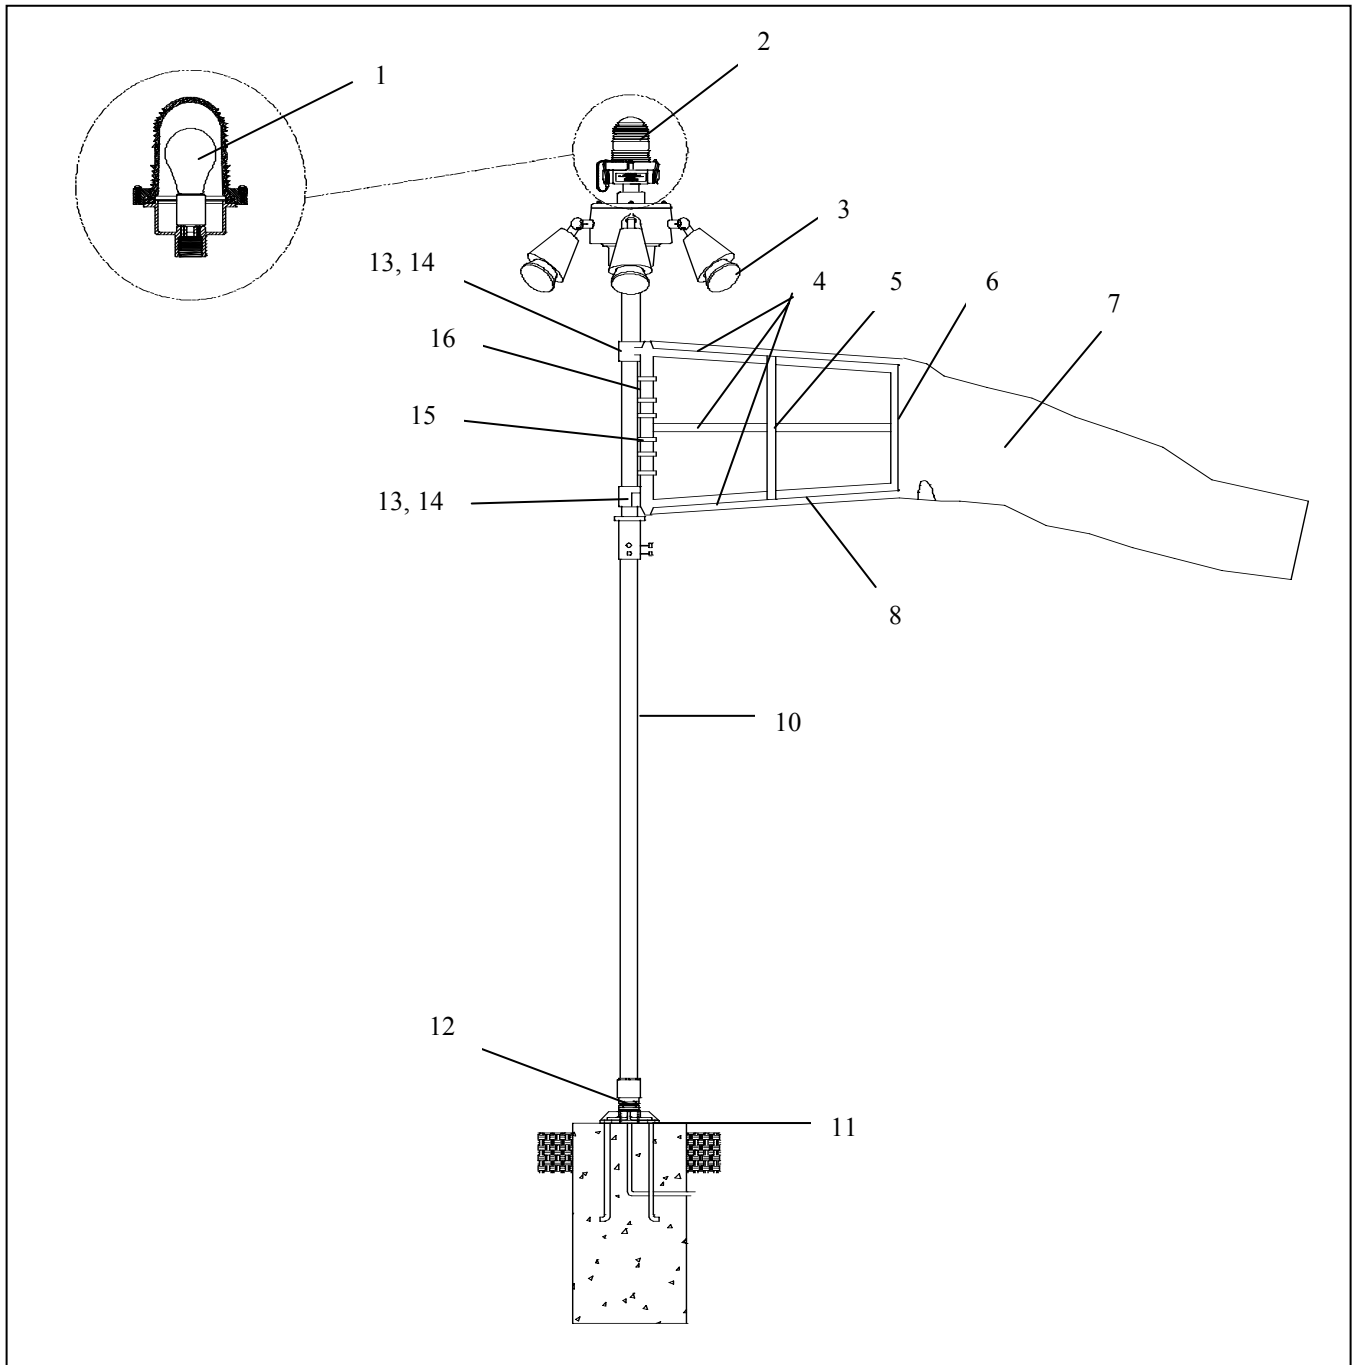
L-806 Wind Cone (With External Lighting Assembly)
